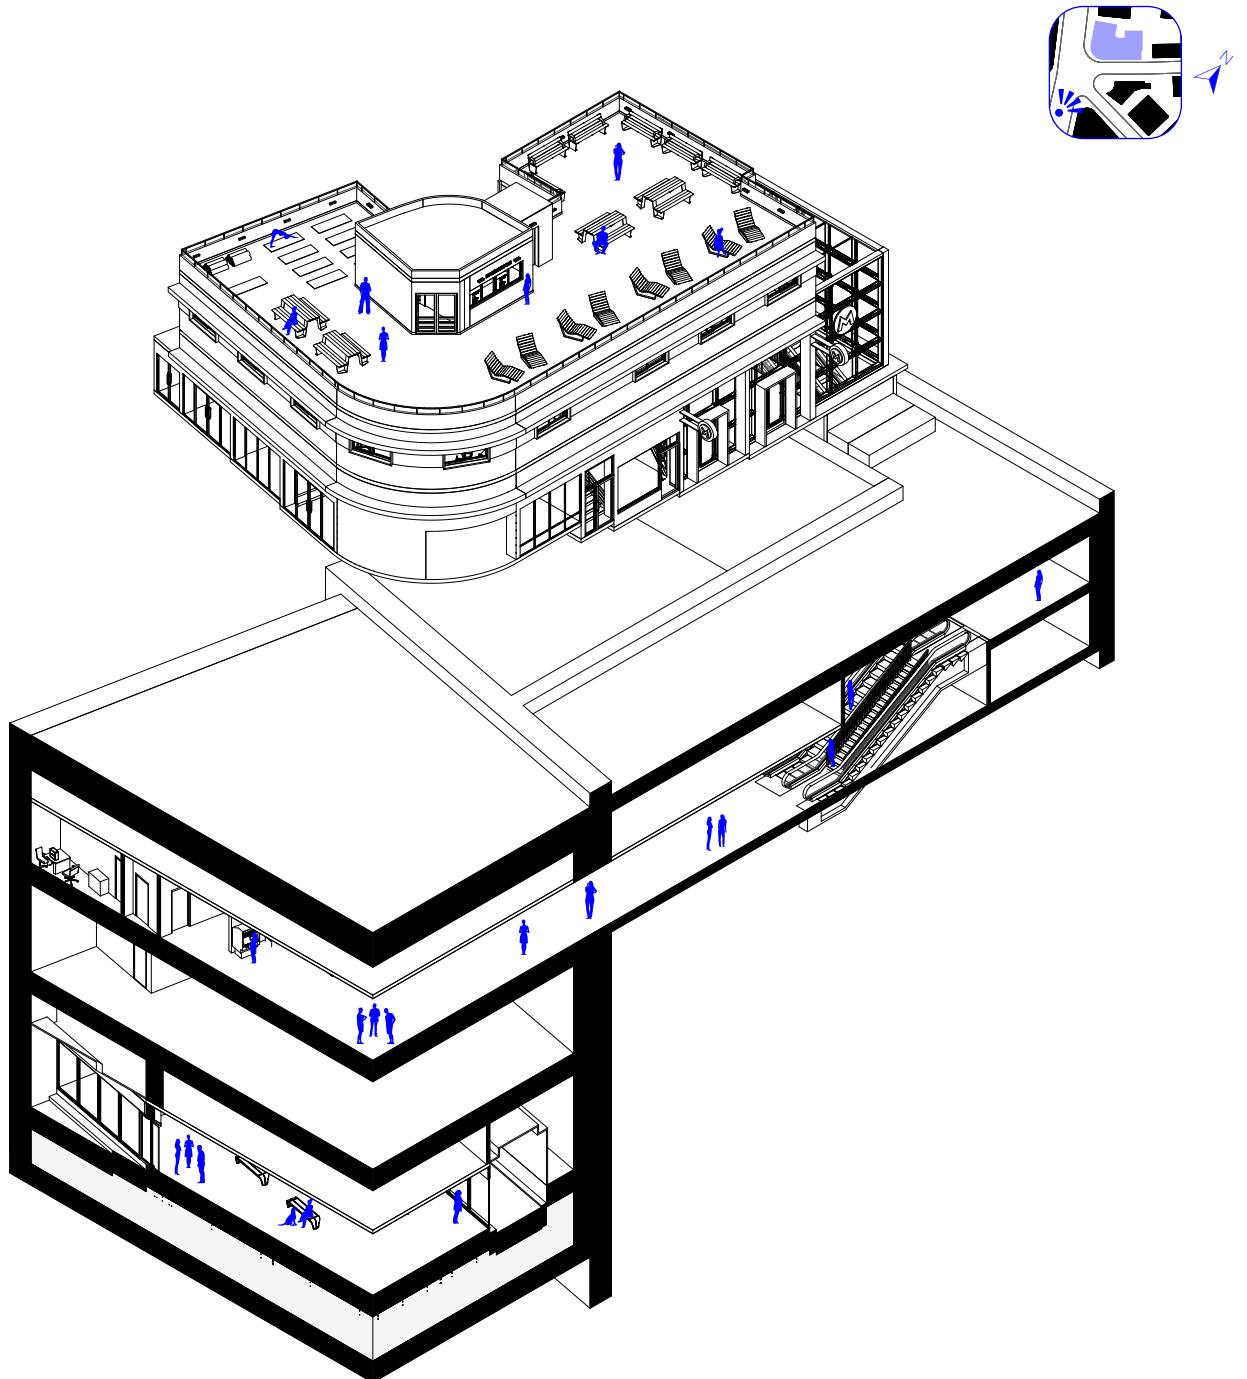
Sectioned axonometric view of Magen David Metro Station with Honigmann House, displaying exit B from metro station to Honigmann House, from the intersection of KingGeorge St and Allenby St.
